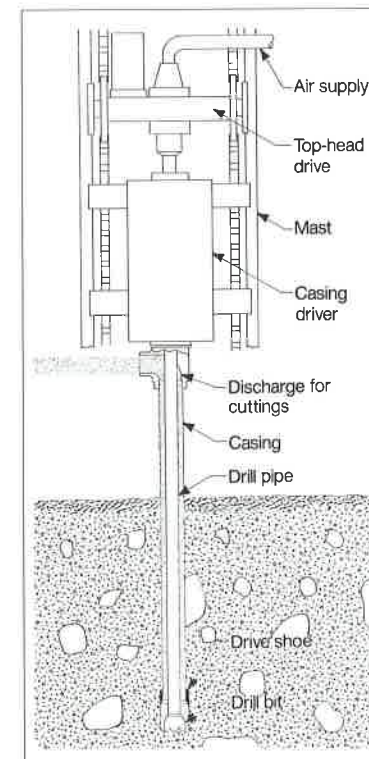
Casing drivers can be fitted to tophead drive rotary rigs to simultaneously drill and drive casing (Atlas Manufacturing).
